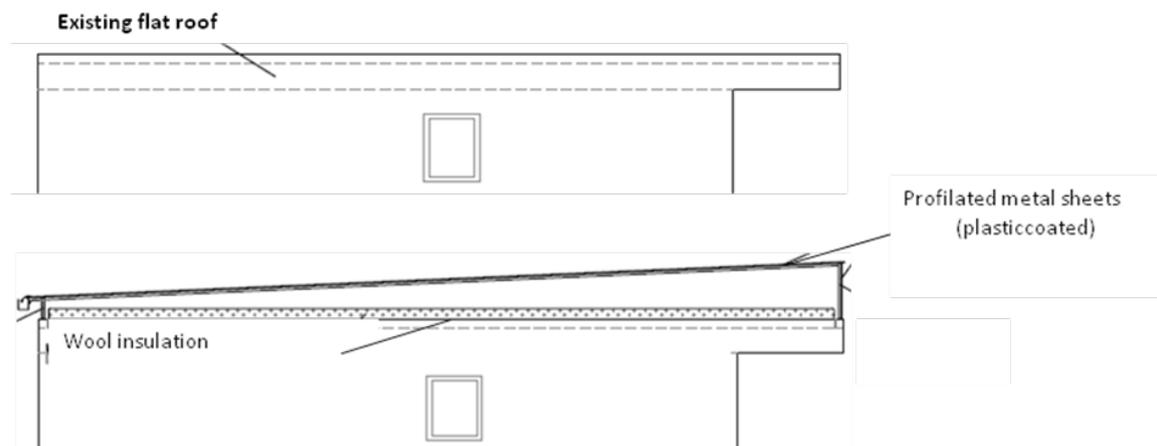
Sketch of added waterproof bearing structure with ventilated cavity underneath
